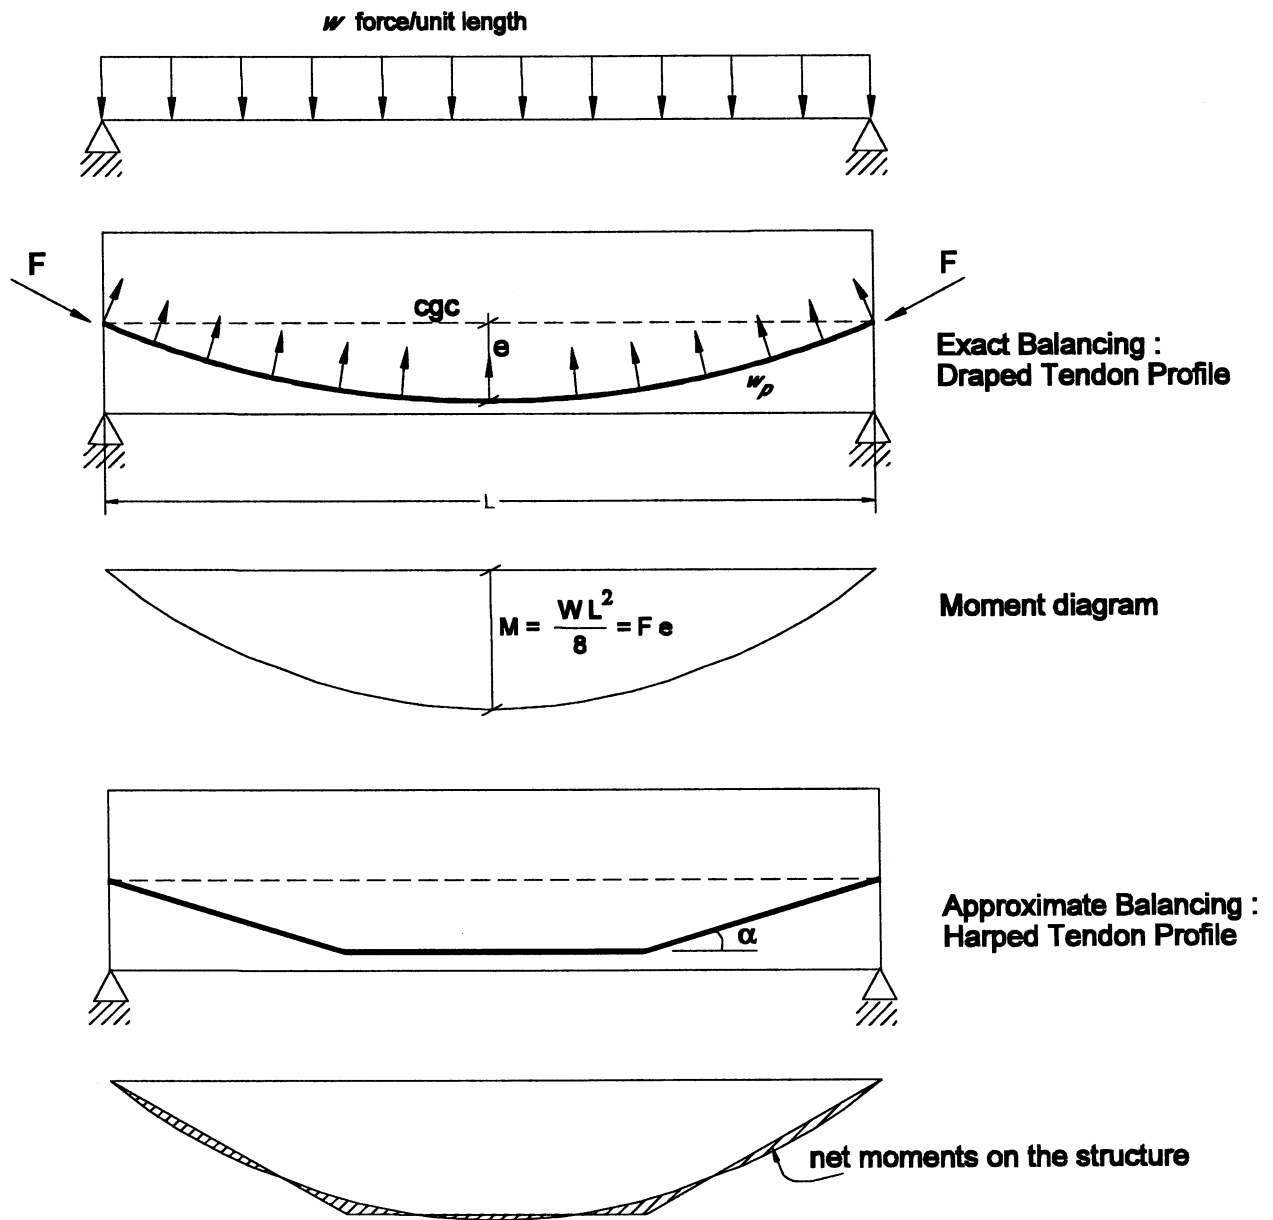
Prestressed Concrete Beam Analogy with Load Balancing Tendons
